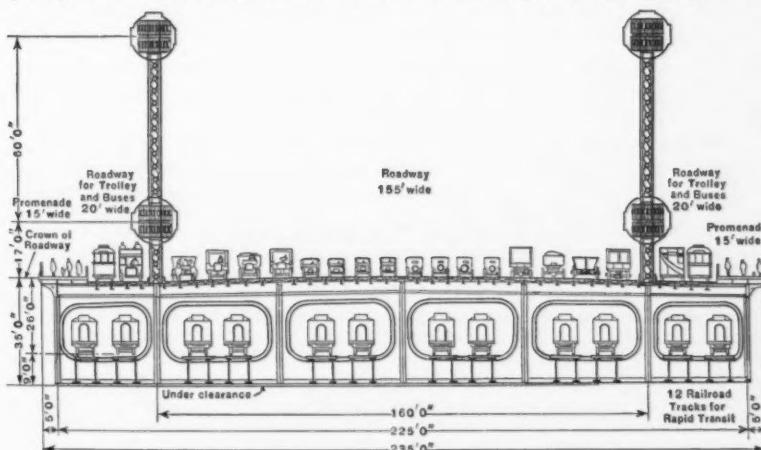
TYPICAL CROSS-SECTION; EYE-BAR SUSPENSION BRIDGE DESIGN,
